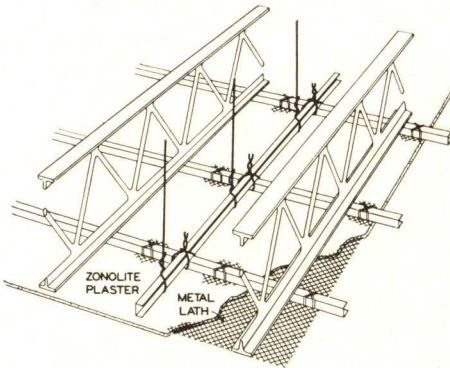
Hung ceiling Zonolite Plaster on Metal Lath.
